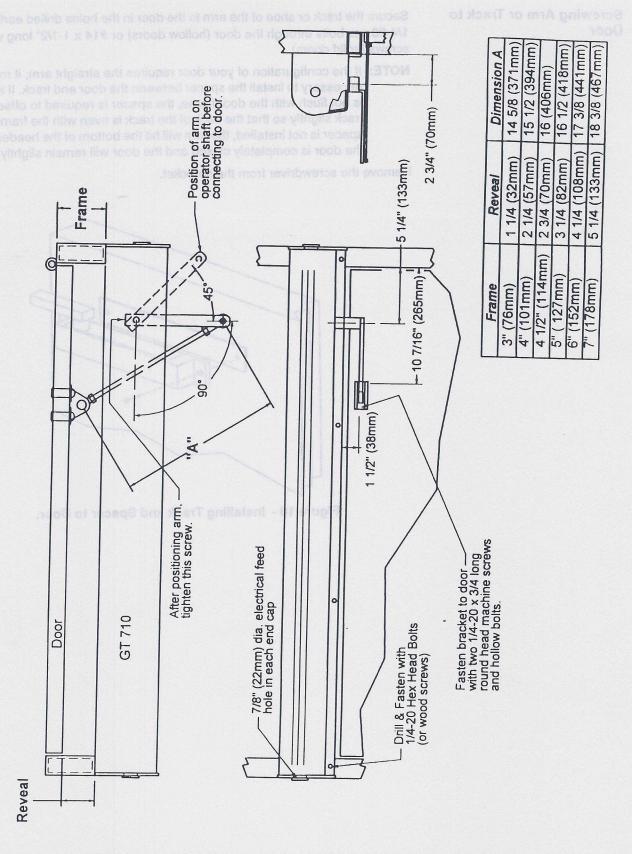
Installation Details, Right Hand Outswing Butt Hinge.
